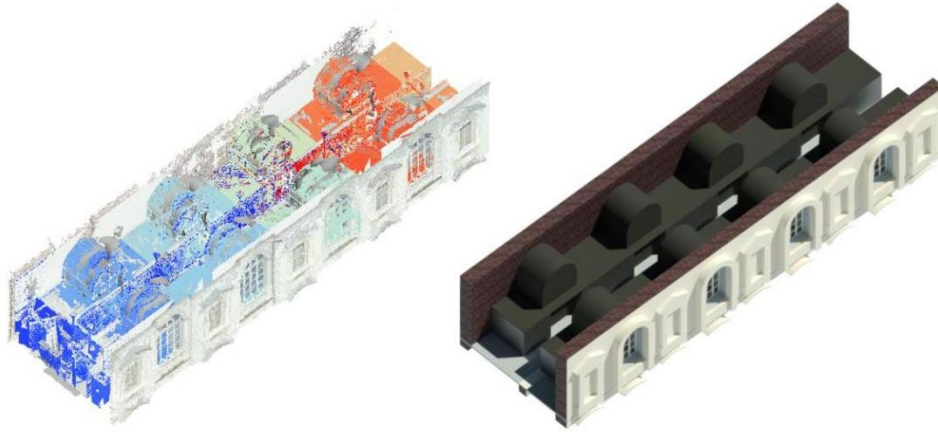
A modeling method for the mezzanine steel structure on the First Floor
